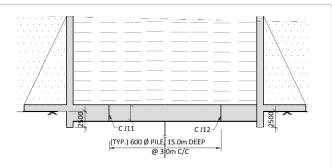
Typical arrangement of tension piles at base slab (in mm).
